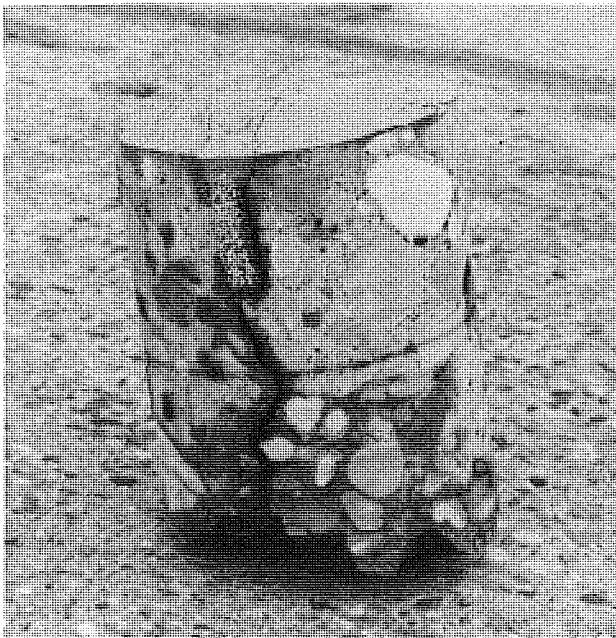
Core from area where bond failure between epoxy and concrete had occurred. No penetration of the epoxy into the plane-of-weakness crack was noted.
